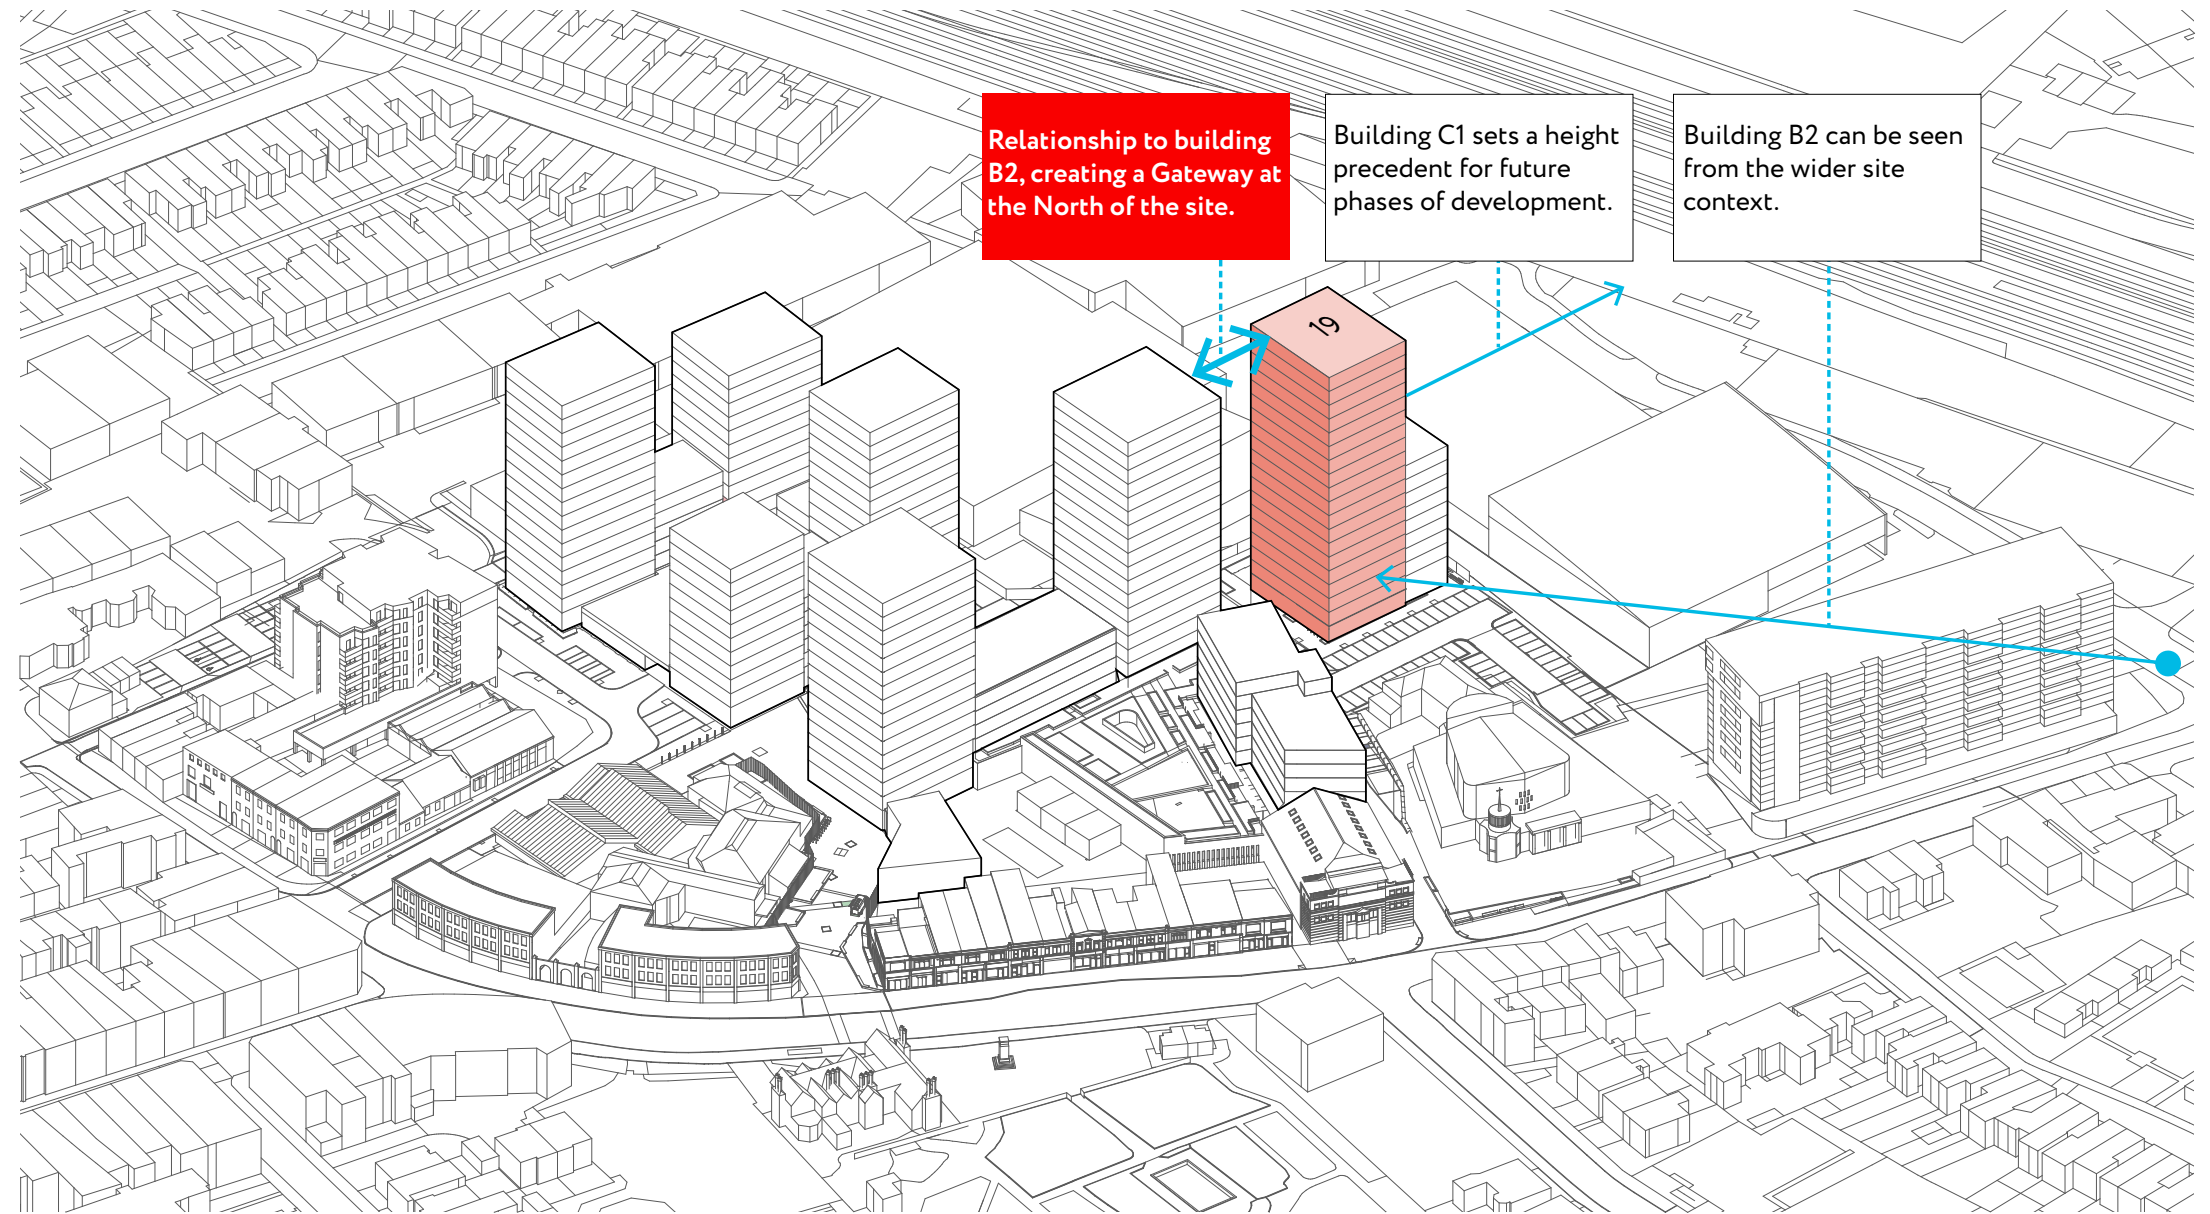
BUILDING C1 DESIGN ASSESSMENT
